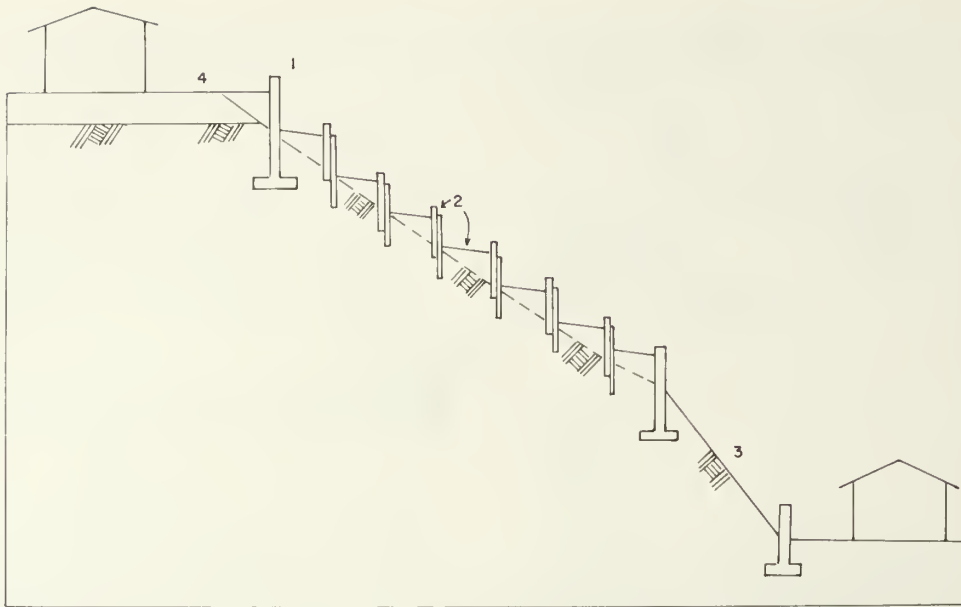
Diagrammatic cross section illustrating alternative remedial measures utilizing a revetment system to stabilize slopes in residential areas of the Baldwin Hills: (1) Construction of retaining wall—foundation of retaining wall should be properly designed and placed in firm bedrock (coissons or piles are frequently used). Permeable materials and proper drainage devices and relatively impervious surface blanket should be placed behind retaining wall to reduce hydrostatic pressure. (2) Retention structures—these generally consist of vertical pipes and boards. Pipes are driven into competent bedrock; back fill placed behind boards should be compacted and provided with proper surface drainage devices and proper slope vegetation cover. (3) Cut-slope should be properly planted and stabilized by retaining structures which should have adequate freeboard and proper surface drainage device to prevent water/mud flow damage to property. (4) Surface water flow on the building pad should be directed away from the slope to the street, and water should not be allowed to flow from the pad down the slope. (Not drawn to scale.)
